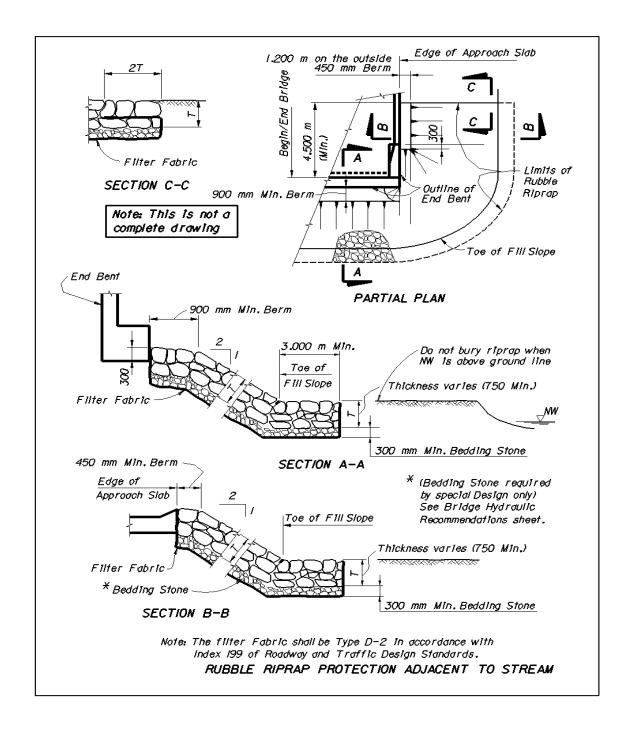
Rubble Riprap Protection Adjacent To Stream
